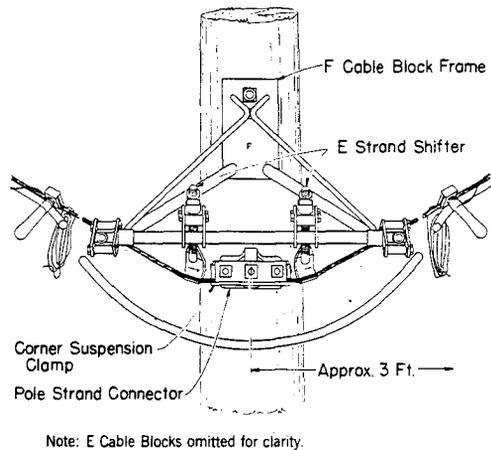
E Strand Shifter Installed on F Cable Block Frame
